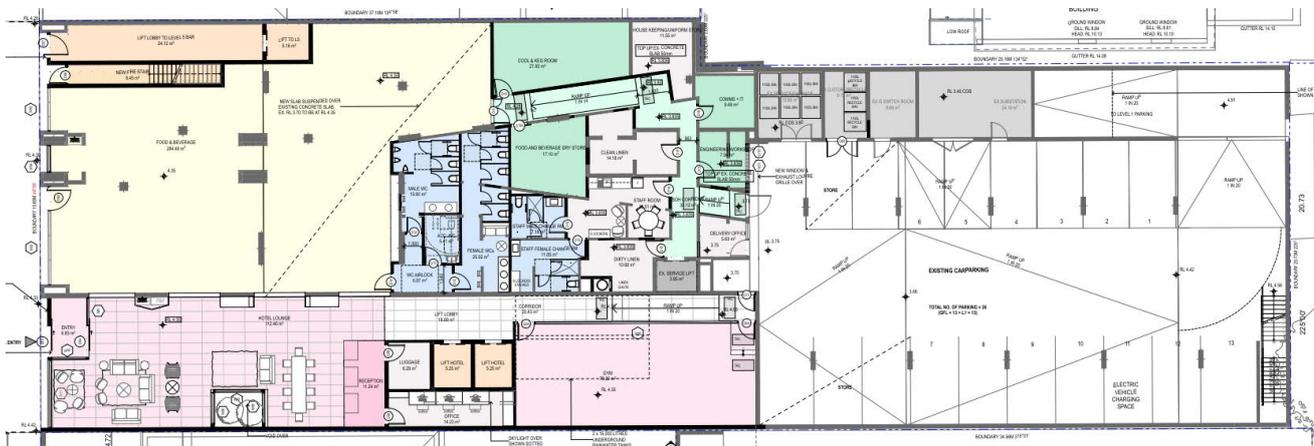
Location of the rainwater tank under ground floor shown above (red dotted boxes below gym).
